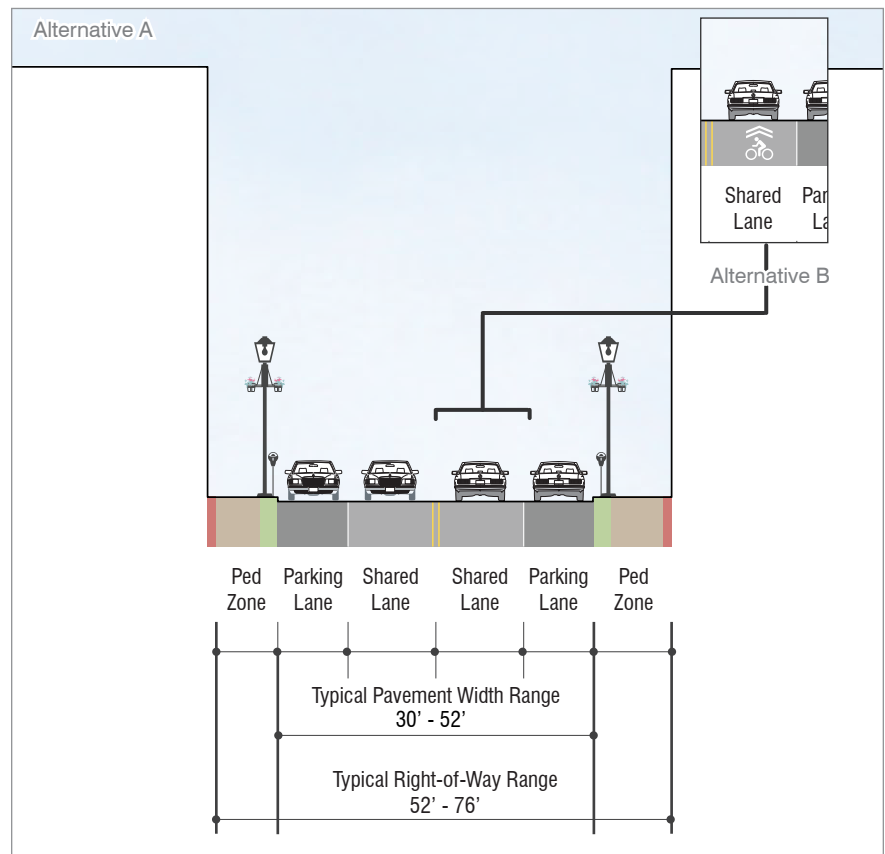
Typical Existing Street Section for 'Alley/ Access Road' Typology
